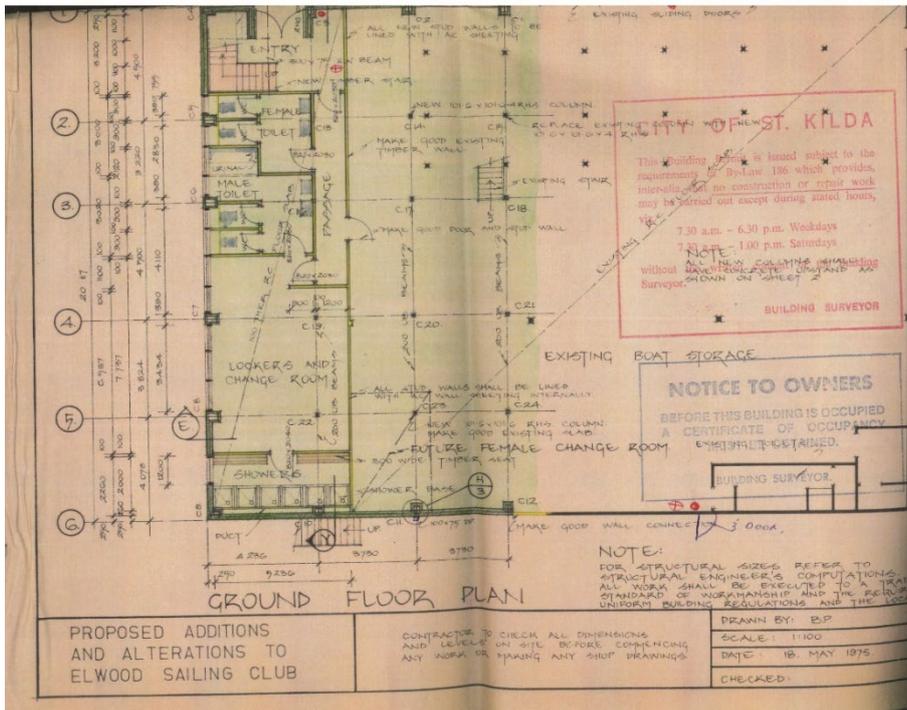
Detail of the Ground Floor Plan, dated 1975. (Source: City of St Kilda)
